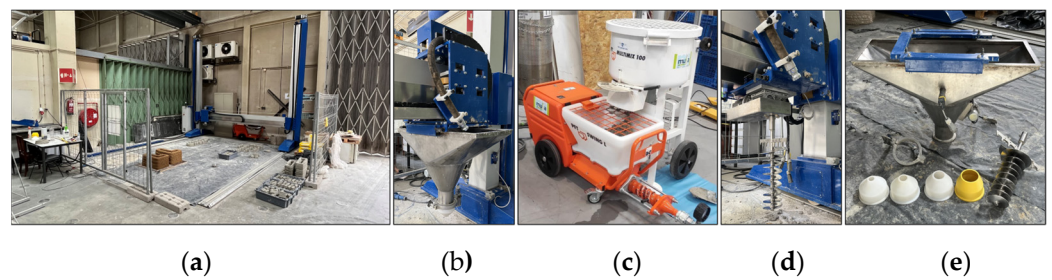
(a) BE MORE 3D's Smart 2500 printer; (b) open material insertion system; (c) injector pump; (d) continuous screw; (e) extrusion nozzles.
